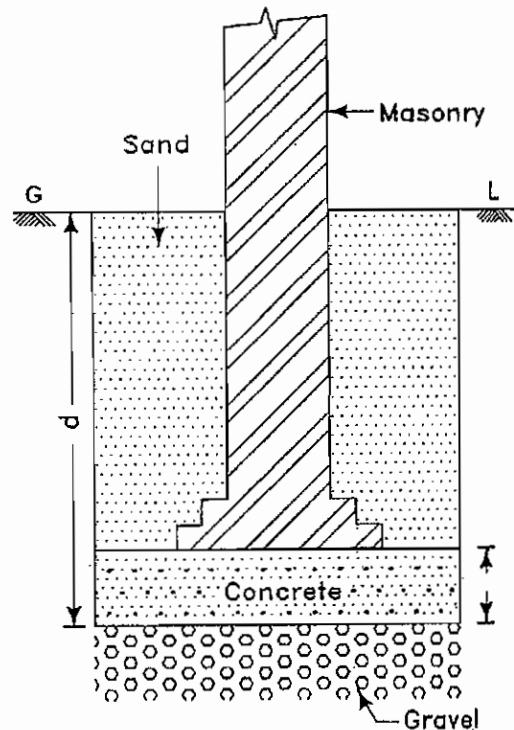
Foundations Constructed in Black Cotton Soil
